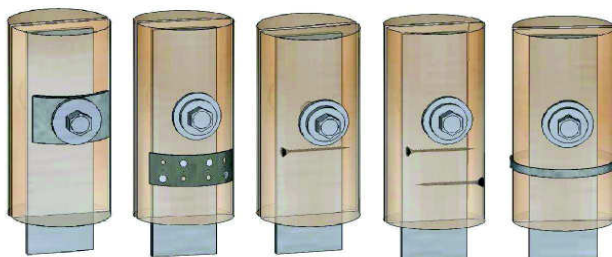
Reinforcement methods: (from left) modified washers, BOVA plate, one screw, two screws, steel band
